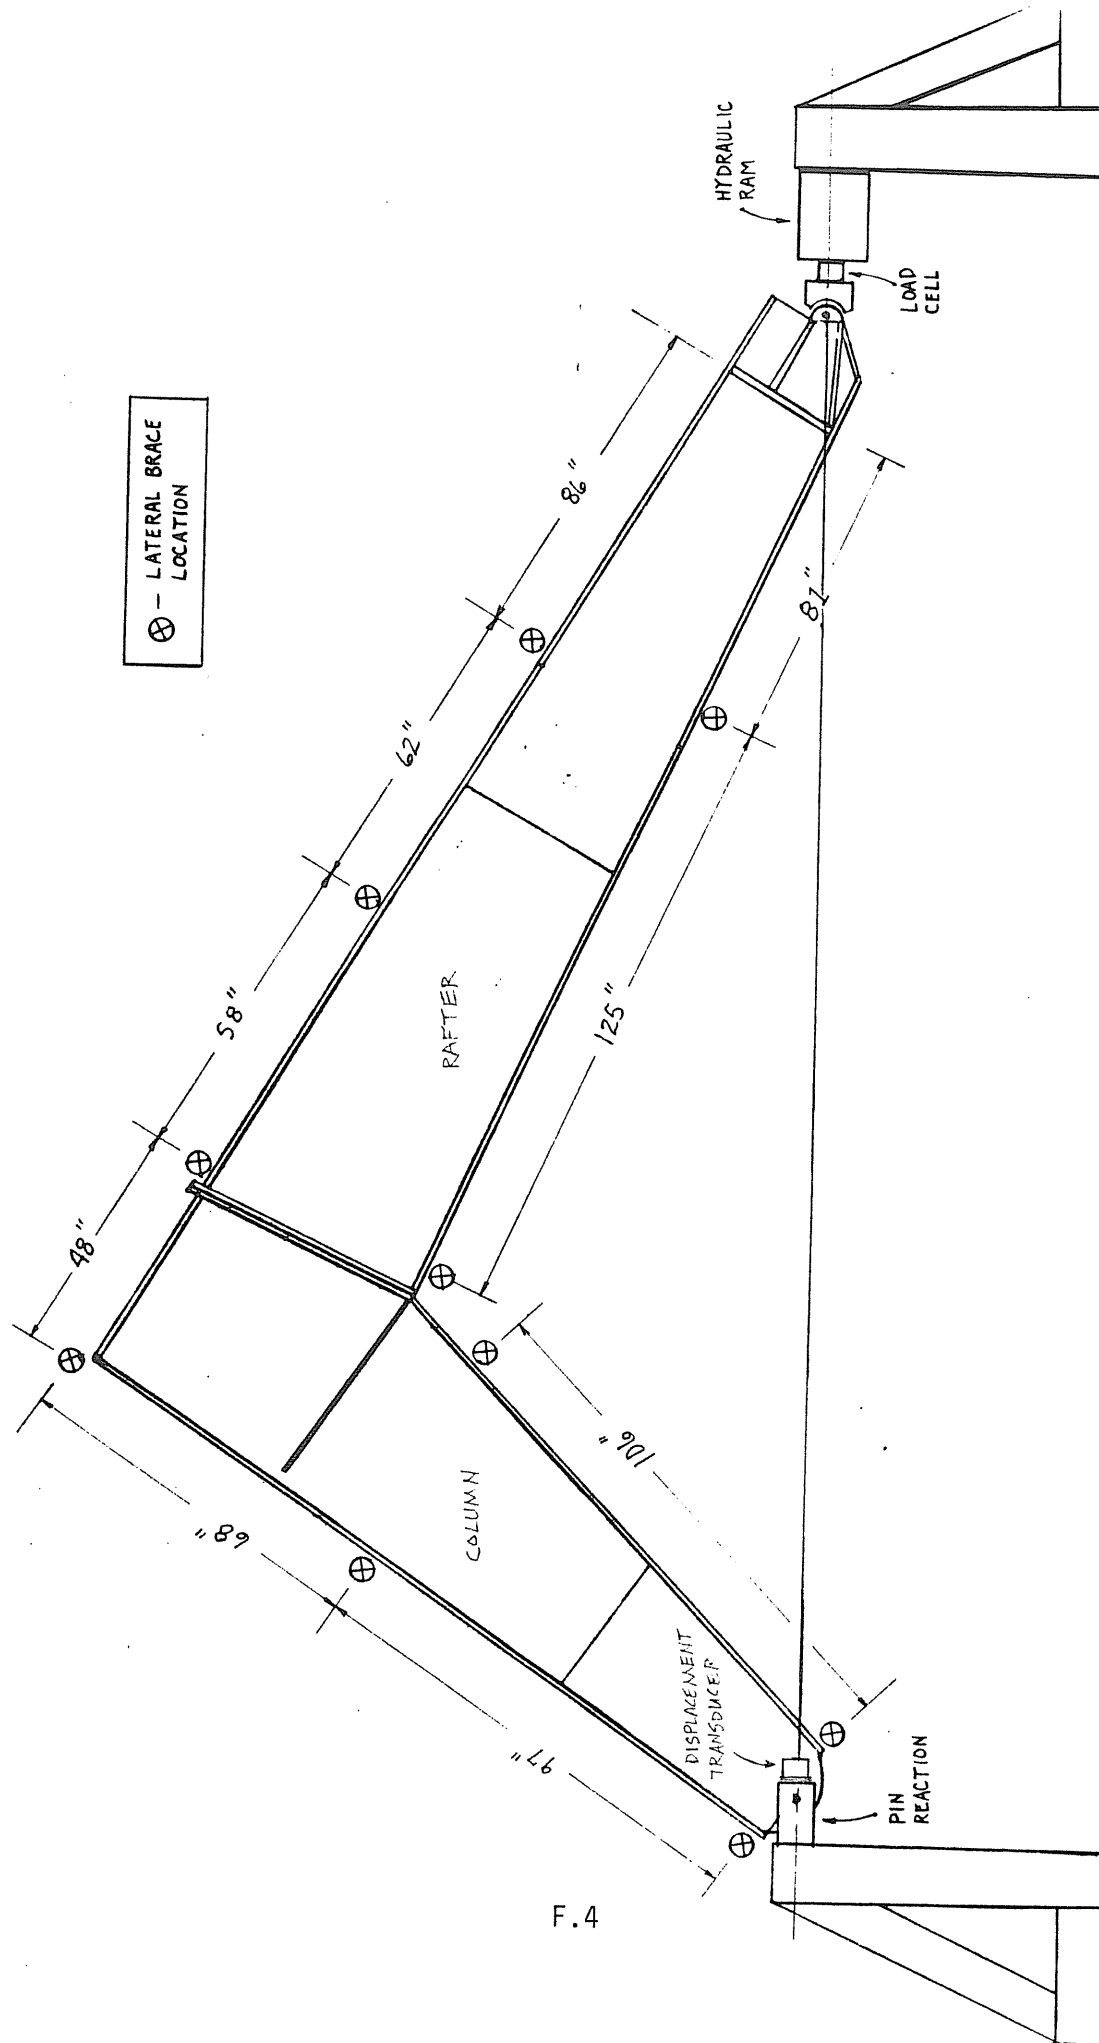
LATERAL BRACE LOCATIONS, TEST FA-6
